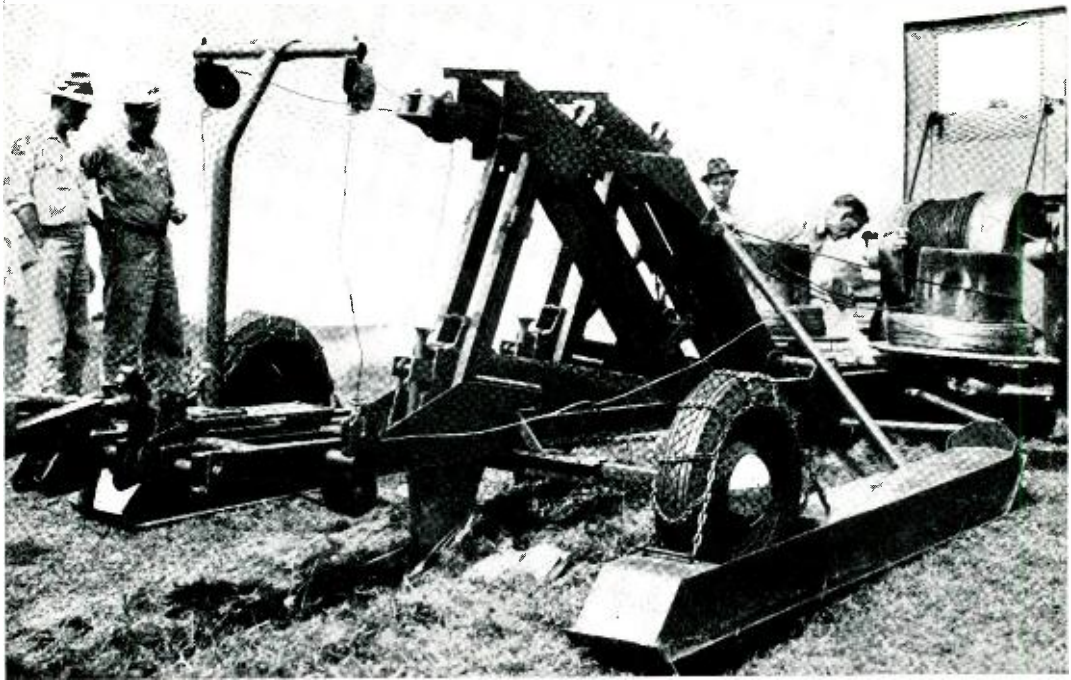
Two standard wire-laying plows adapted to form a dual unit for laying shield wires simultaneously on each side of a cable. pontoons insure placing the wires at uniform depth
